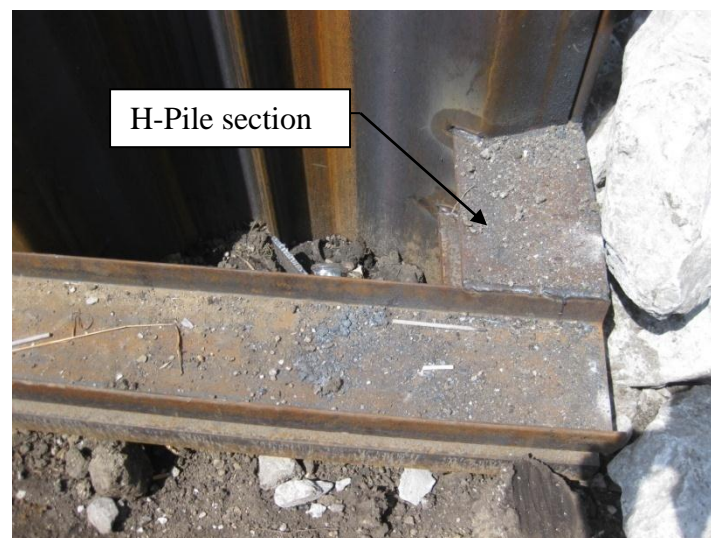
H-pile splice used on 90 degree wingwall waler of west abutment
